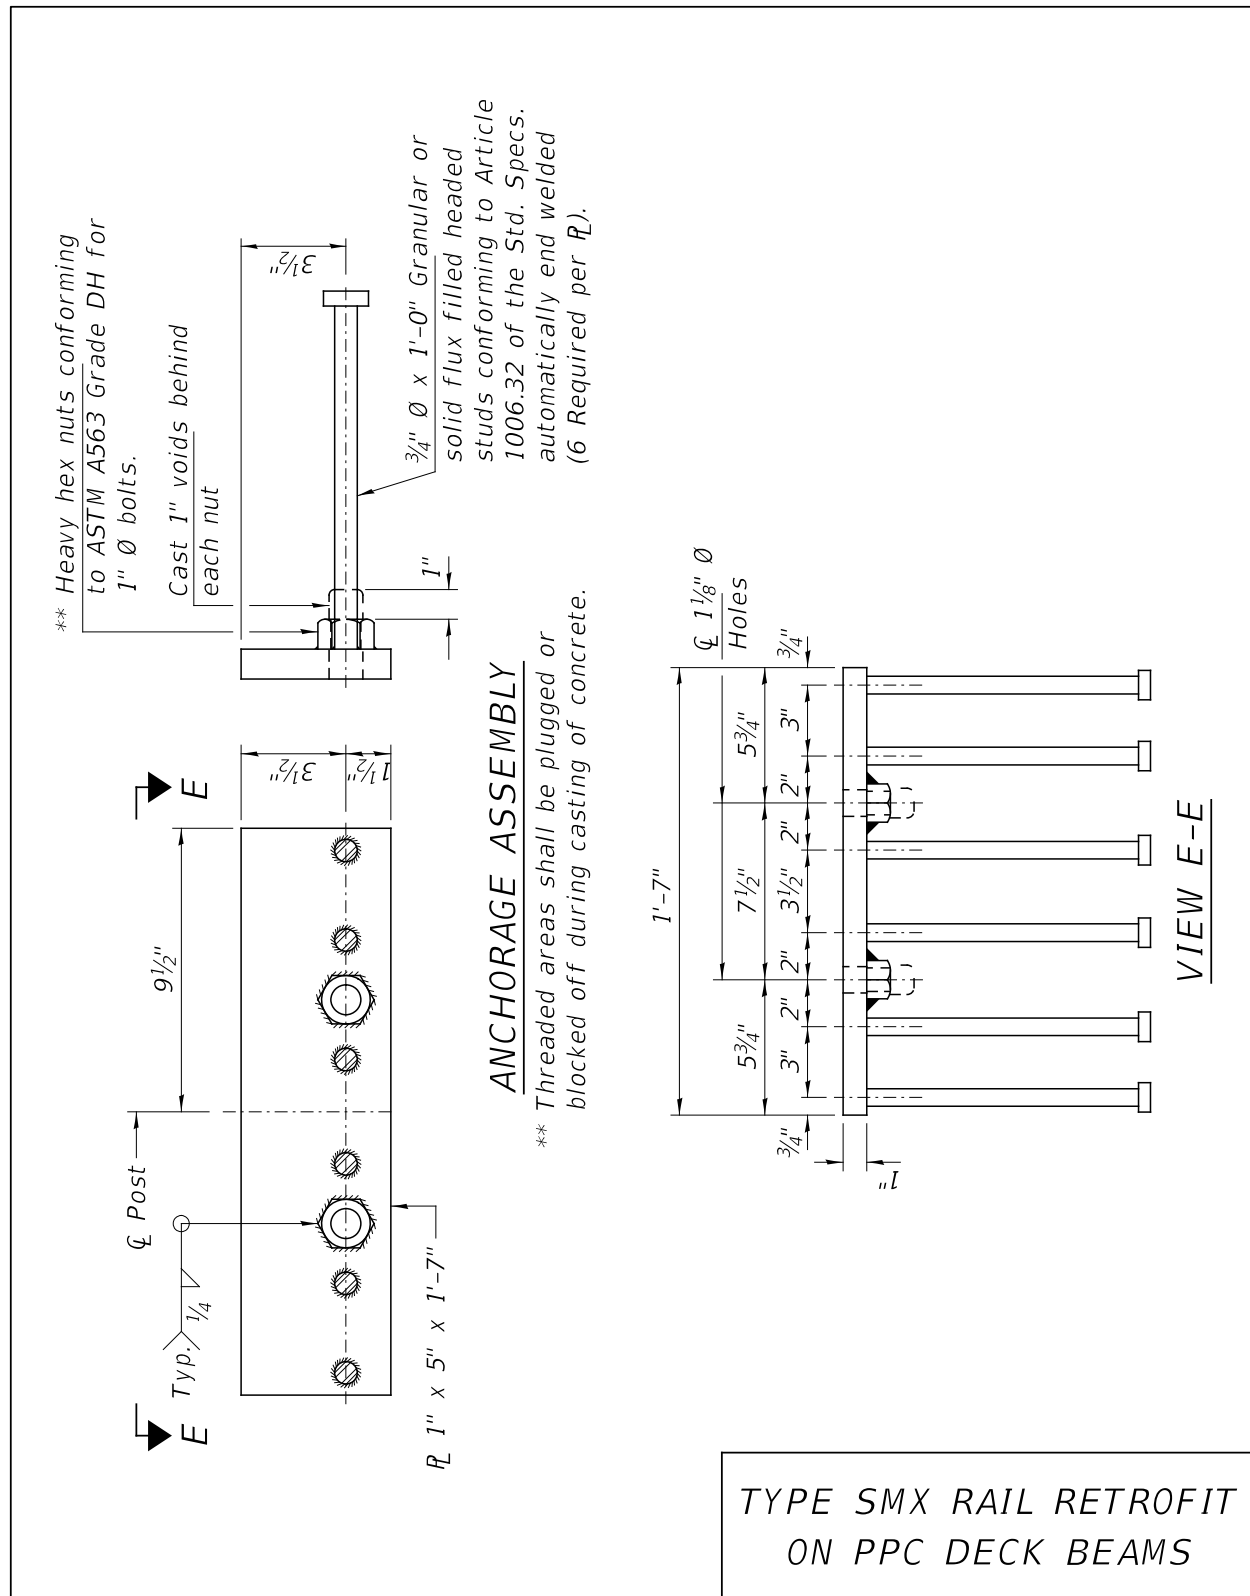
Type SMX Rail Retrofit on PPC Deck Beams
